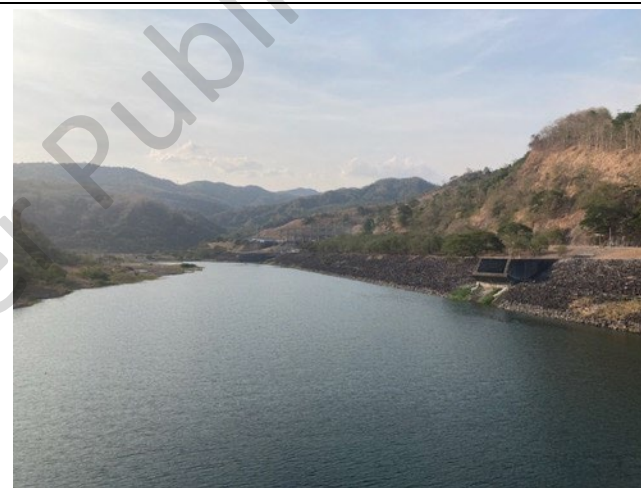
Agno River between powerhouse and regulating pond, with low-level outlet on left bank
